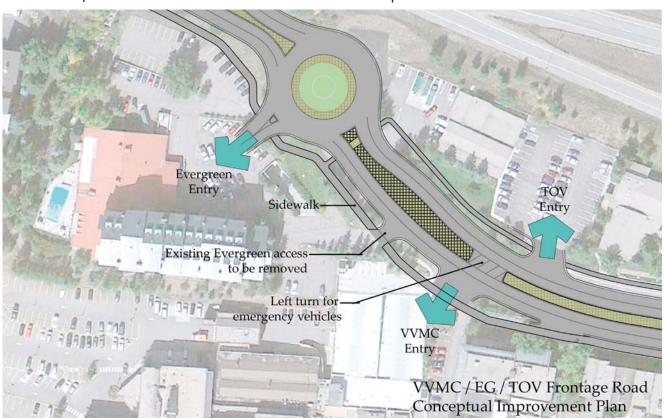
Conceptual design of South Frontage Road access improvements.
